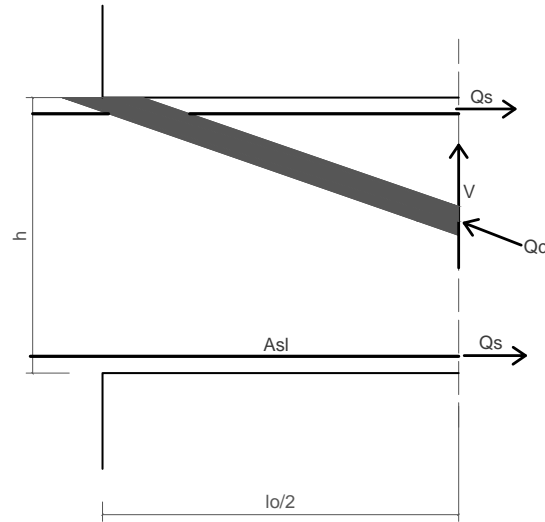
Strut and tie mechanism for coupling beam with longitudinal reinforcement
